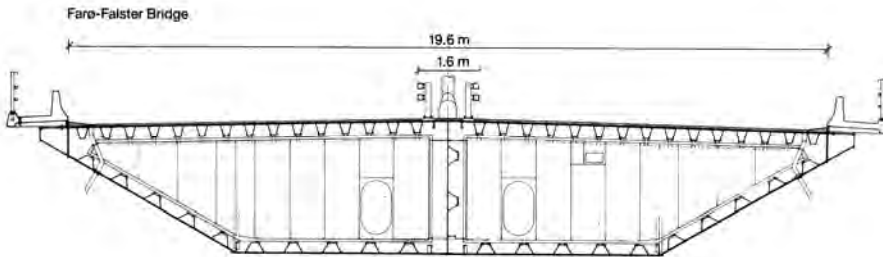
Cross-sectional view of steel girder on the Farø Bridges.
